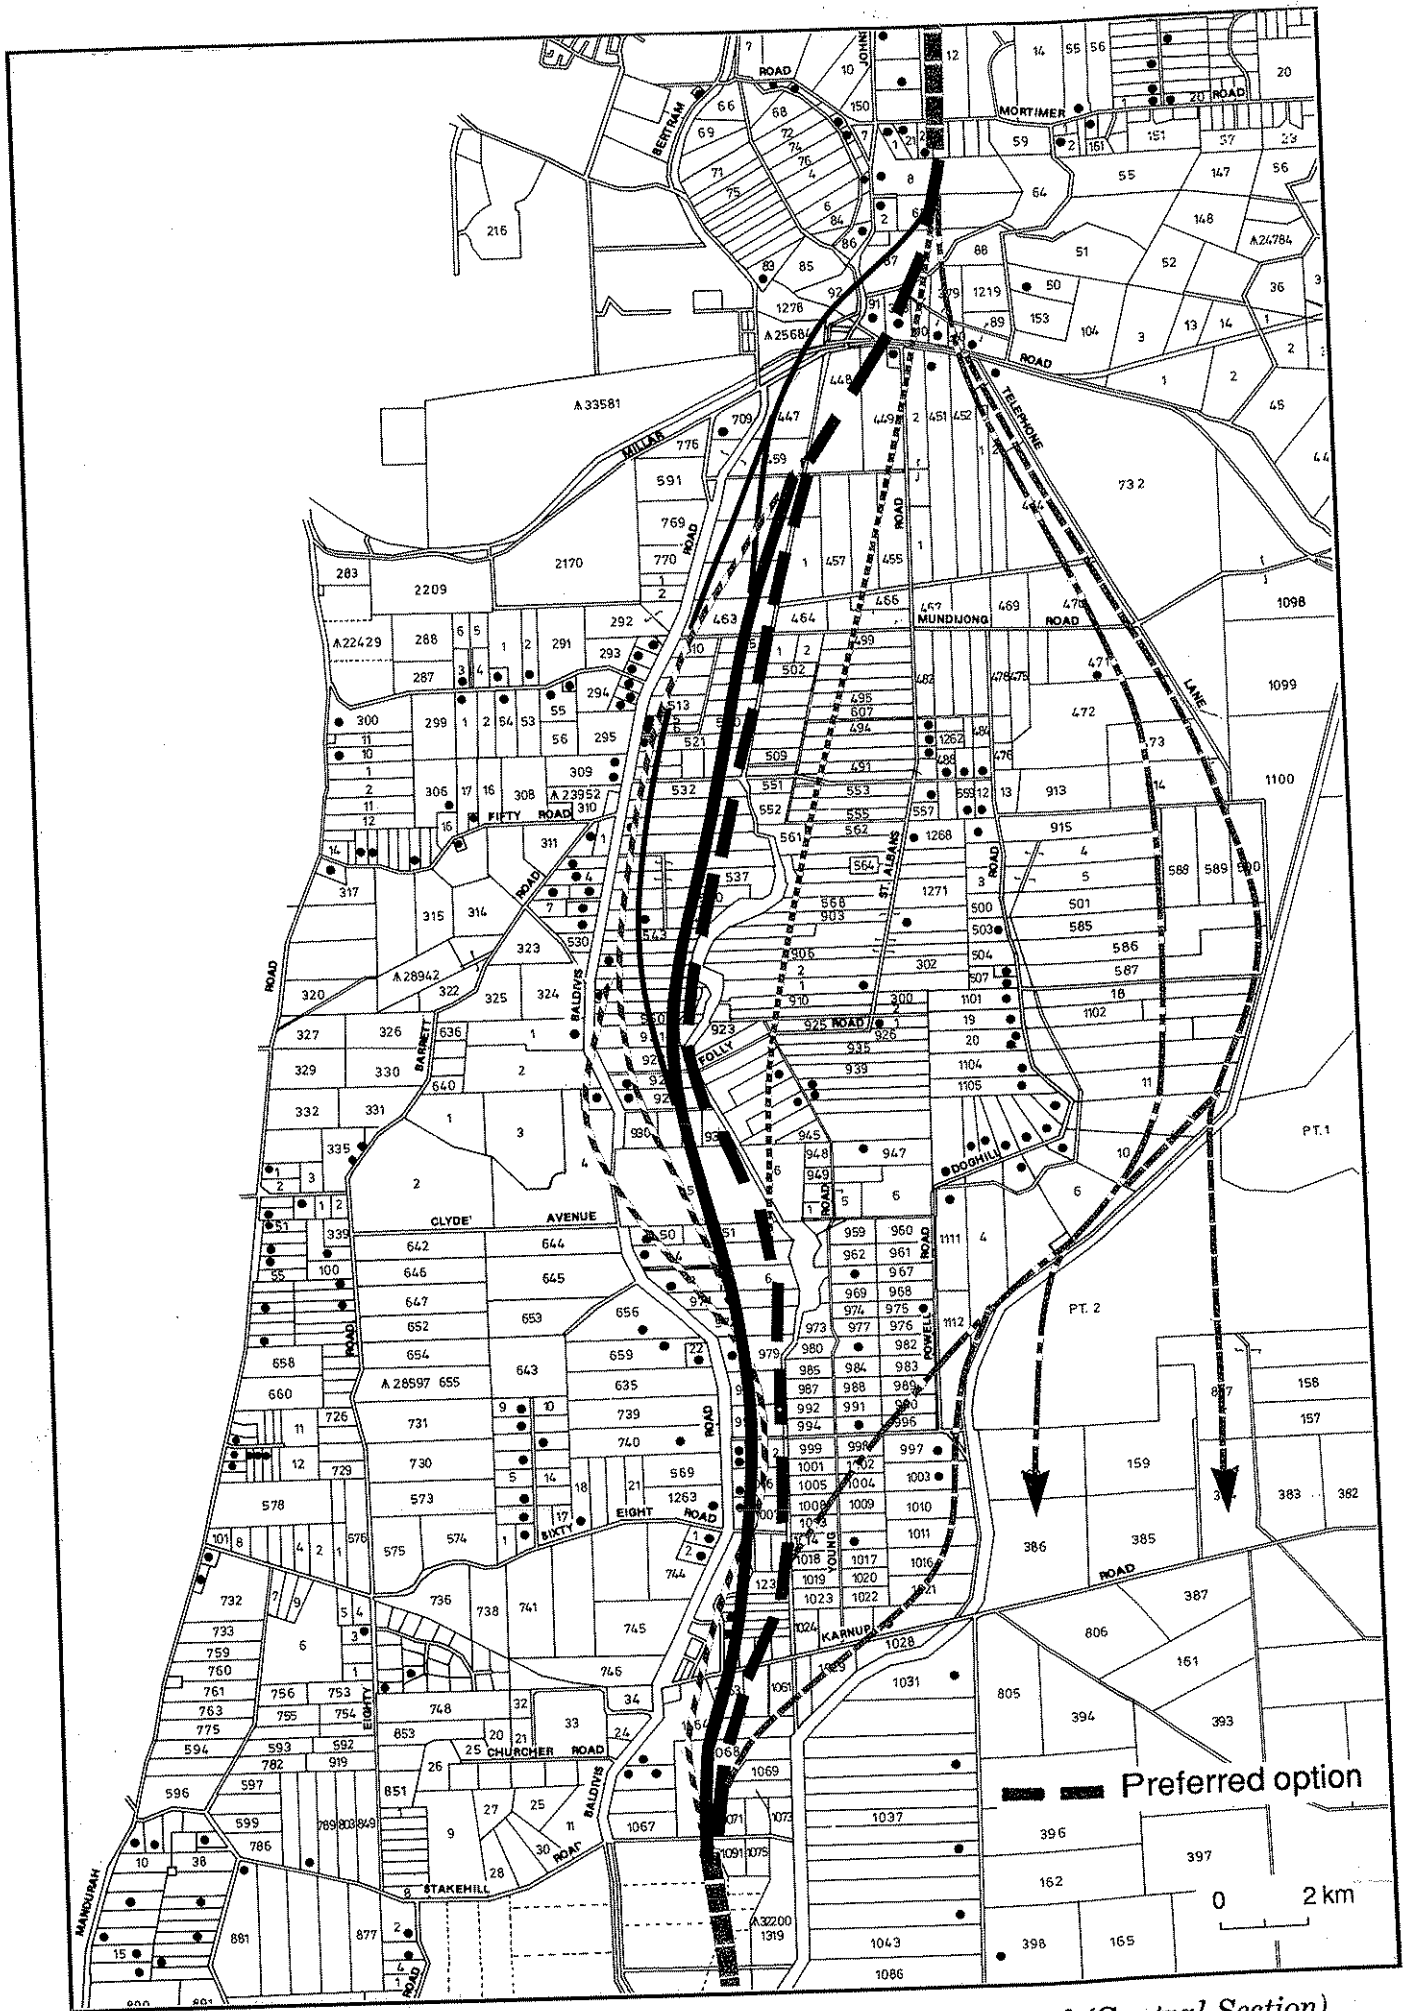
Routes investigated between Mortimer Road and Stakehill Road (Central Section)
